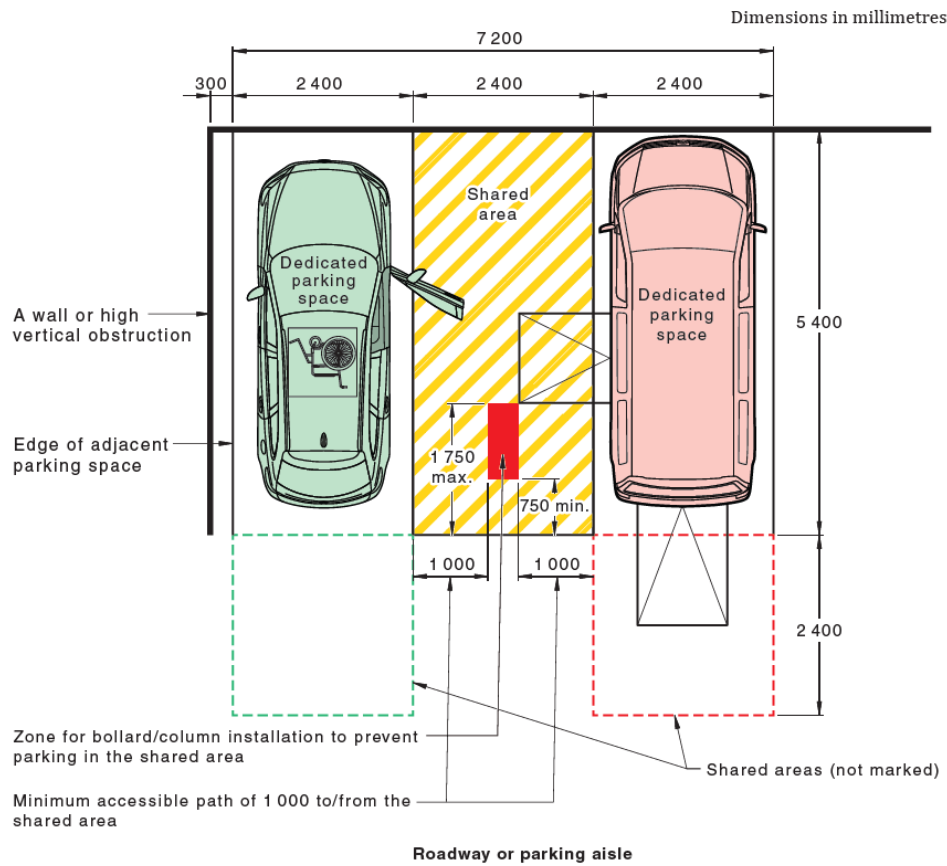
Plan view of accessible space and shared space requirements (AS 2890.6:2022 Fig 2.1 & 2.2)
